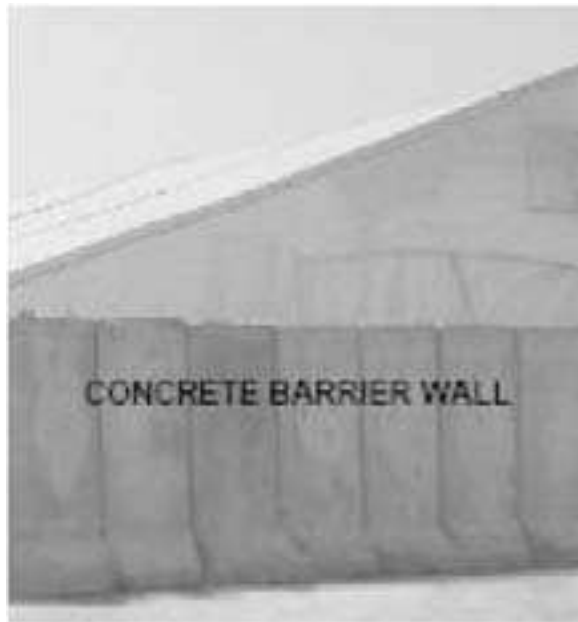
Use of concrete revetment for full-height sidewall protection
